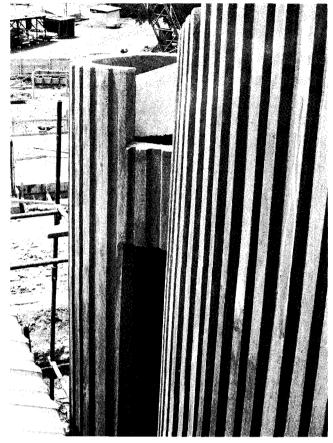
Patterned concrete finish on the walls of the Members' Lobbies, Parliament House extensions, Accra, 1970.
